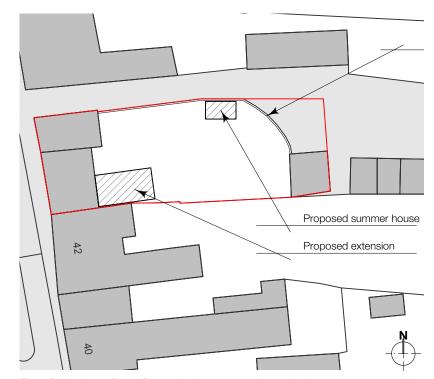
Block plan of Broad Street showing proposed extension in context 1:1500 scale © Crown copyright, All rights reserved. 2021. Licence number 0100031673
